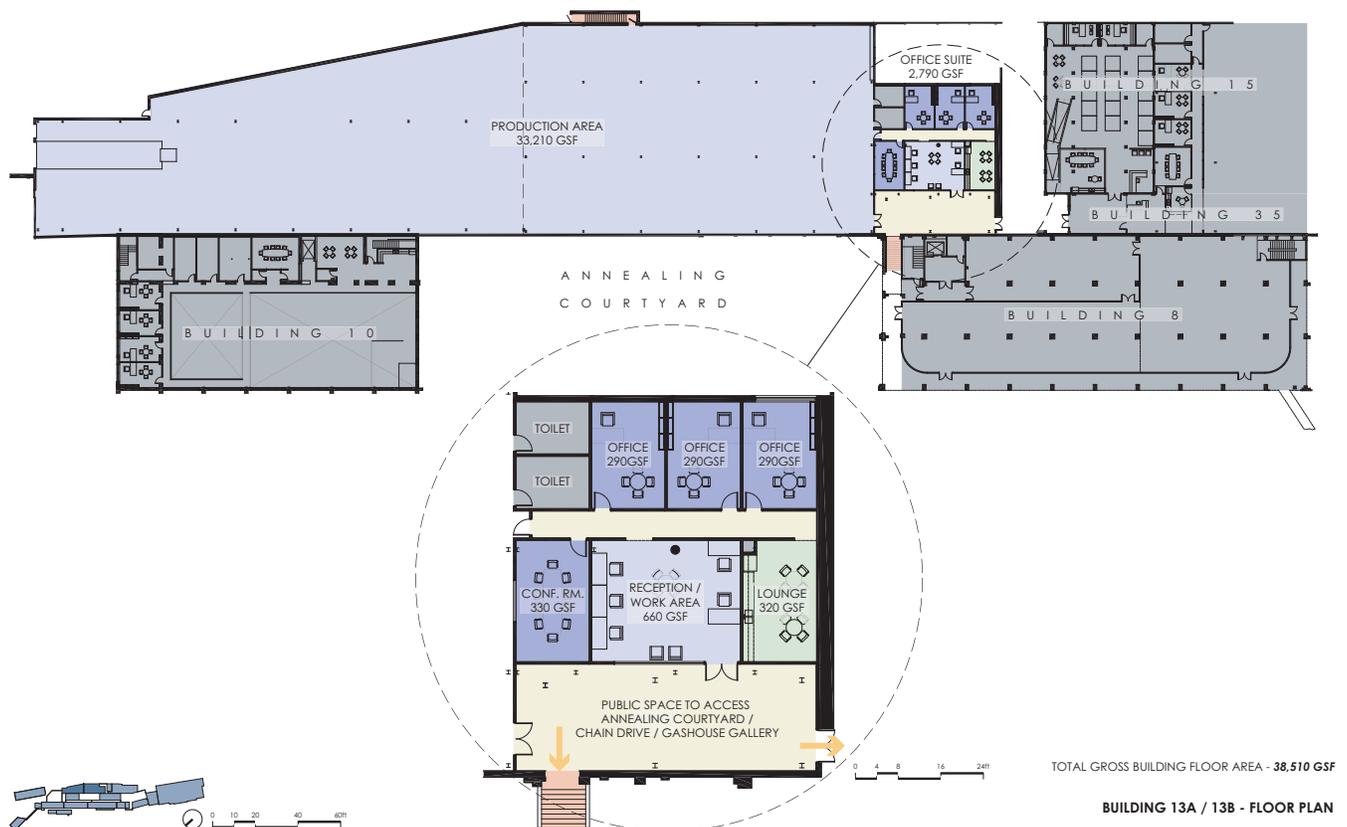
Buildings 13A and 13B - Potential Floor Plan (CJS)
